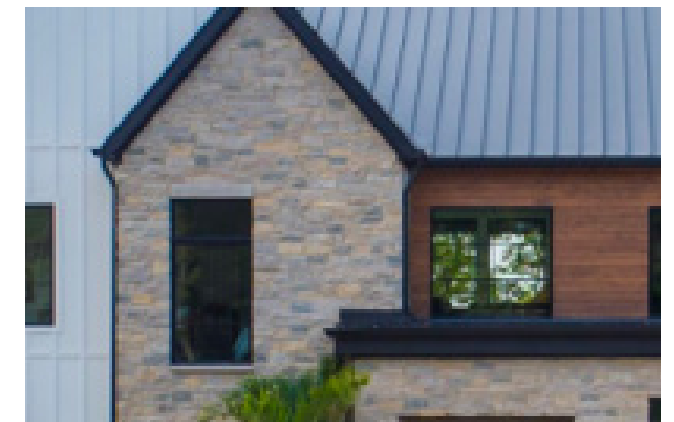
SUBURBAN TRADITIONAL WALLS & WINDOWS
